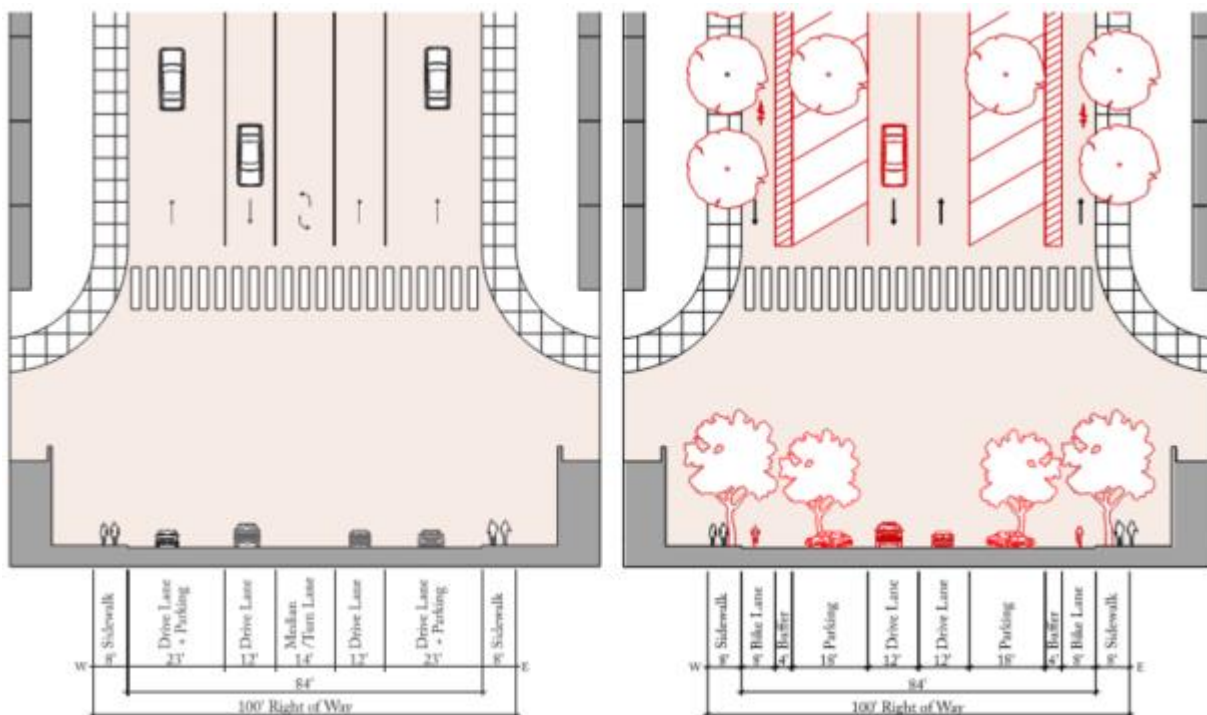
Whittier Boulevard -- Garfield Avenue to Montebello Boulevard
